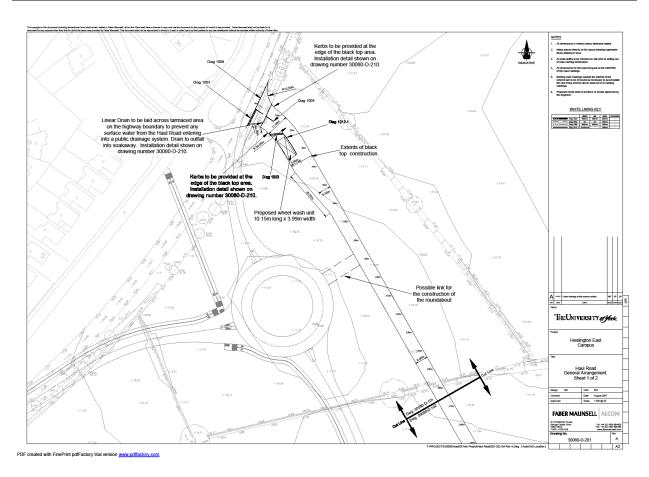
Location plan on the northern portion of the haul road (developer supplied plan, not to scale)
